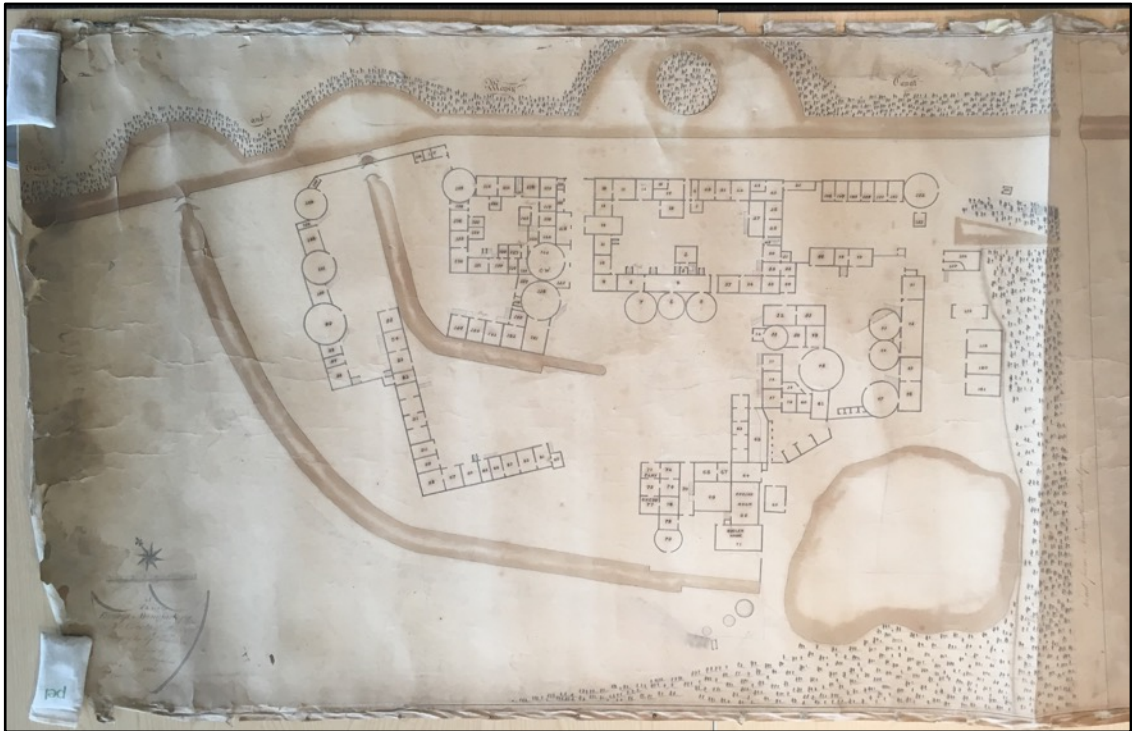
Plan of Etruria Works and waterfront, 1805. Photo © Wedgwood Museum/WWRD.
